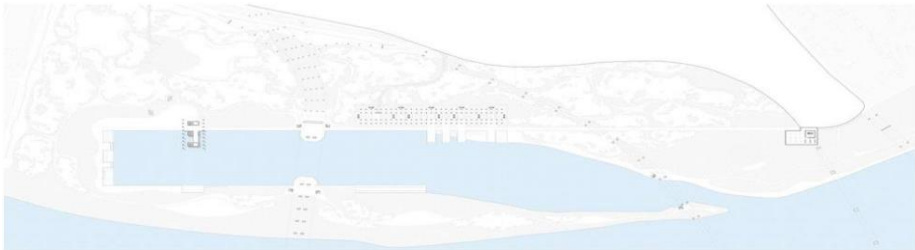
Ground floor plan of the project on the dock on the west bank of the Sava river.
